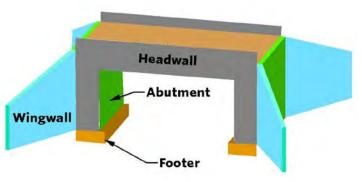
Schematic illustrating the headwall, wingwall, abutment, and footer of a crossing structure.
